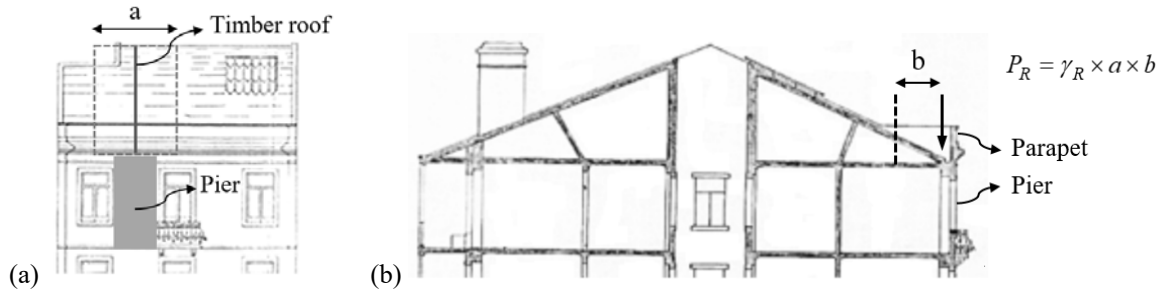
View from the last floor of the buildings: (a) street façade wall and (b) section cut
